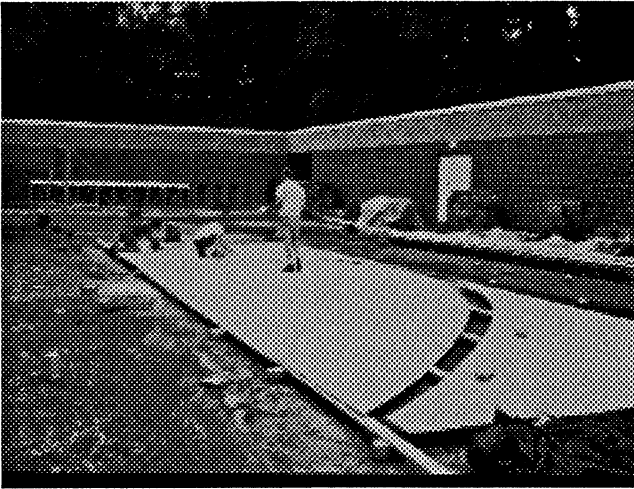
Four 40-foot panels were joined to make each cantilever vault. 50 foot long 1x3's already epoxied together were screwed together from opposite faces of the joints to provide continuous clamping during curing. The 1x3's were then used as the layers for the glue laminated beams. Each of the two 40 x 16 foot sheets of joined plywood were cut to the parabolic shape of the flattened cantilever vaults. Scrap material was used for the center section between cantilever vaults.
